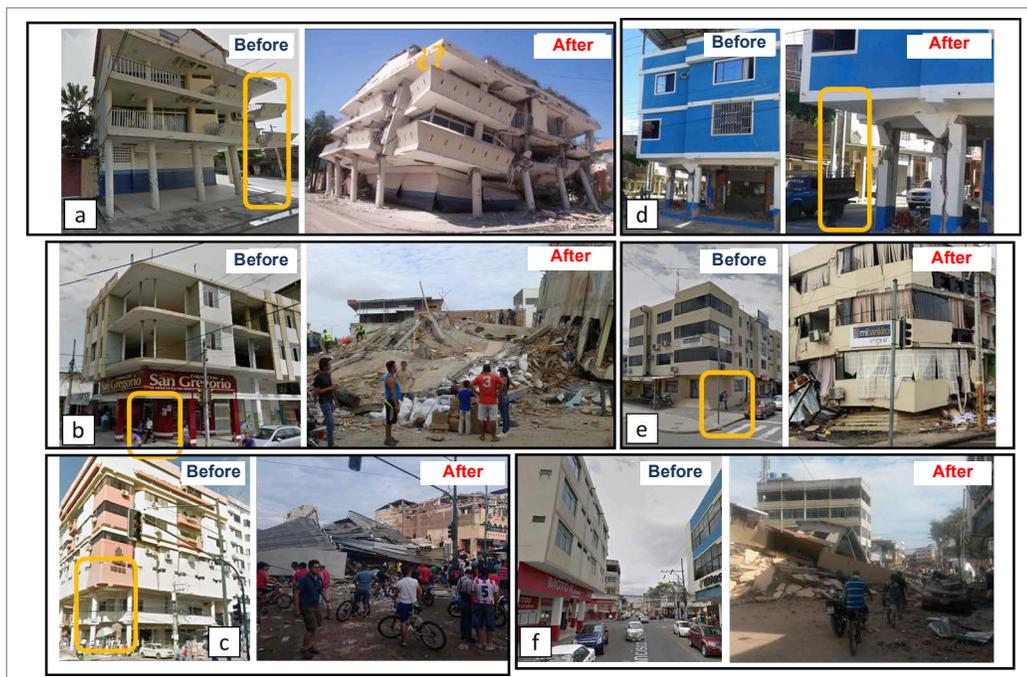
Other collapsed buildings in Portoviejo, without corner column
